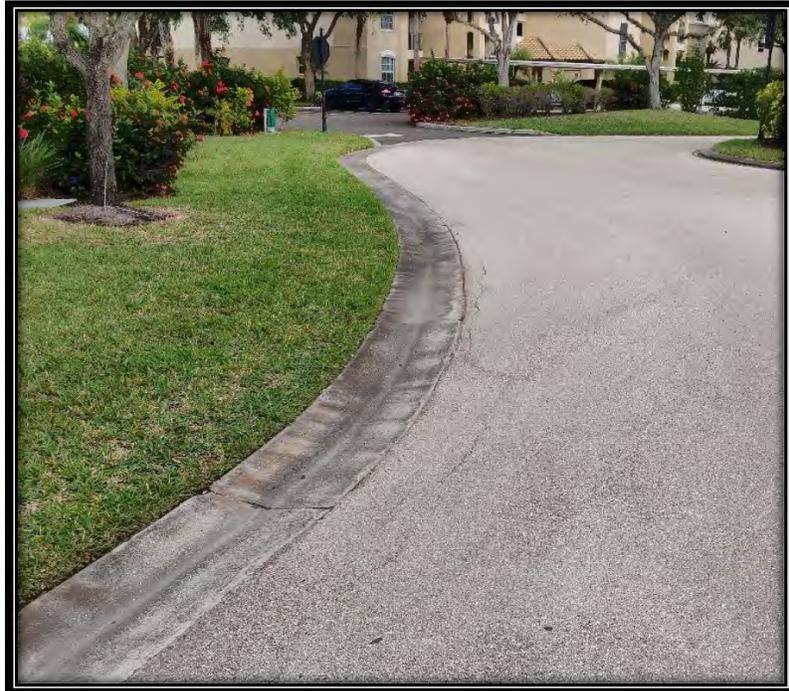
Minor cracks in pavement on Turnberry Lake Dr. roundabout near 4670 Turnberry Lake Dr.
